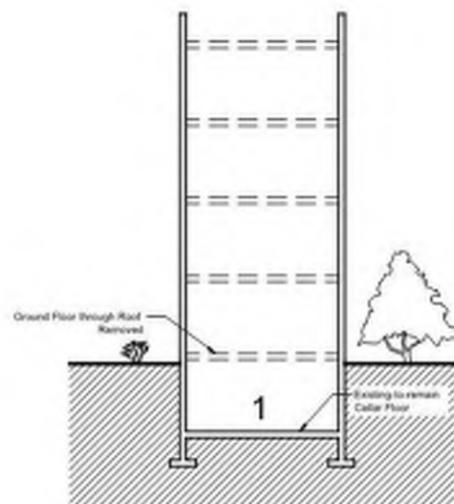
Existing 1968 Code four-story building with cellar. Three of six floors to be removed. Exterior walls to remain.
